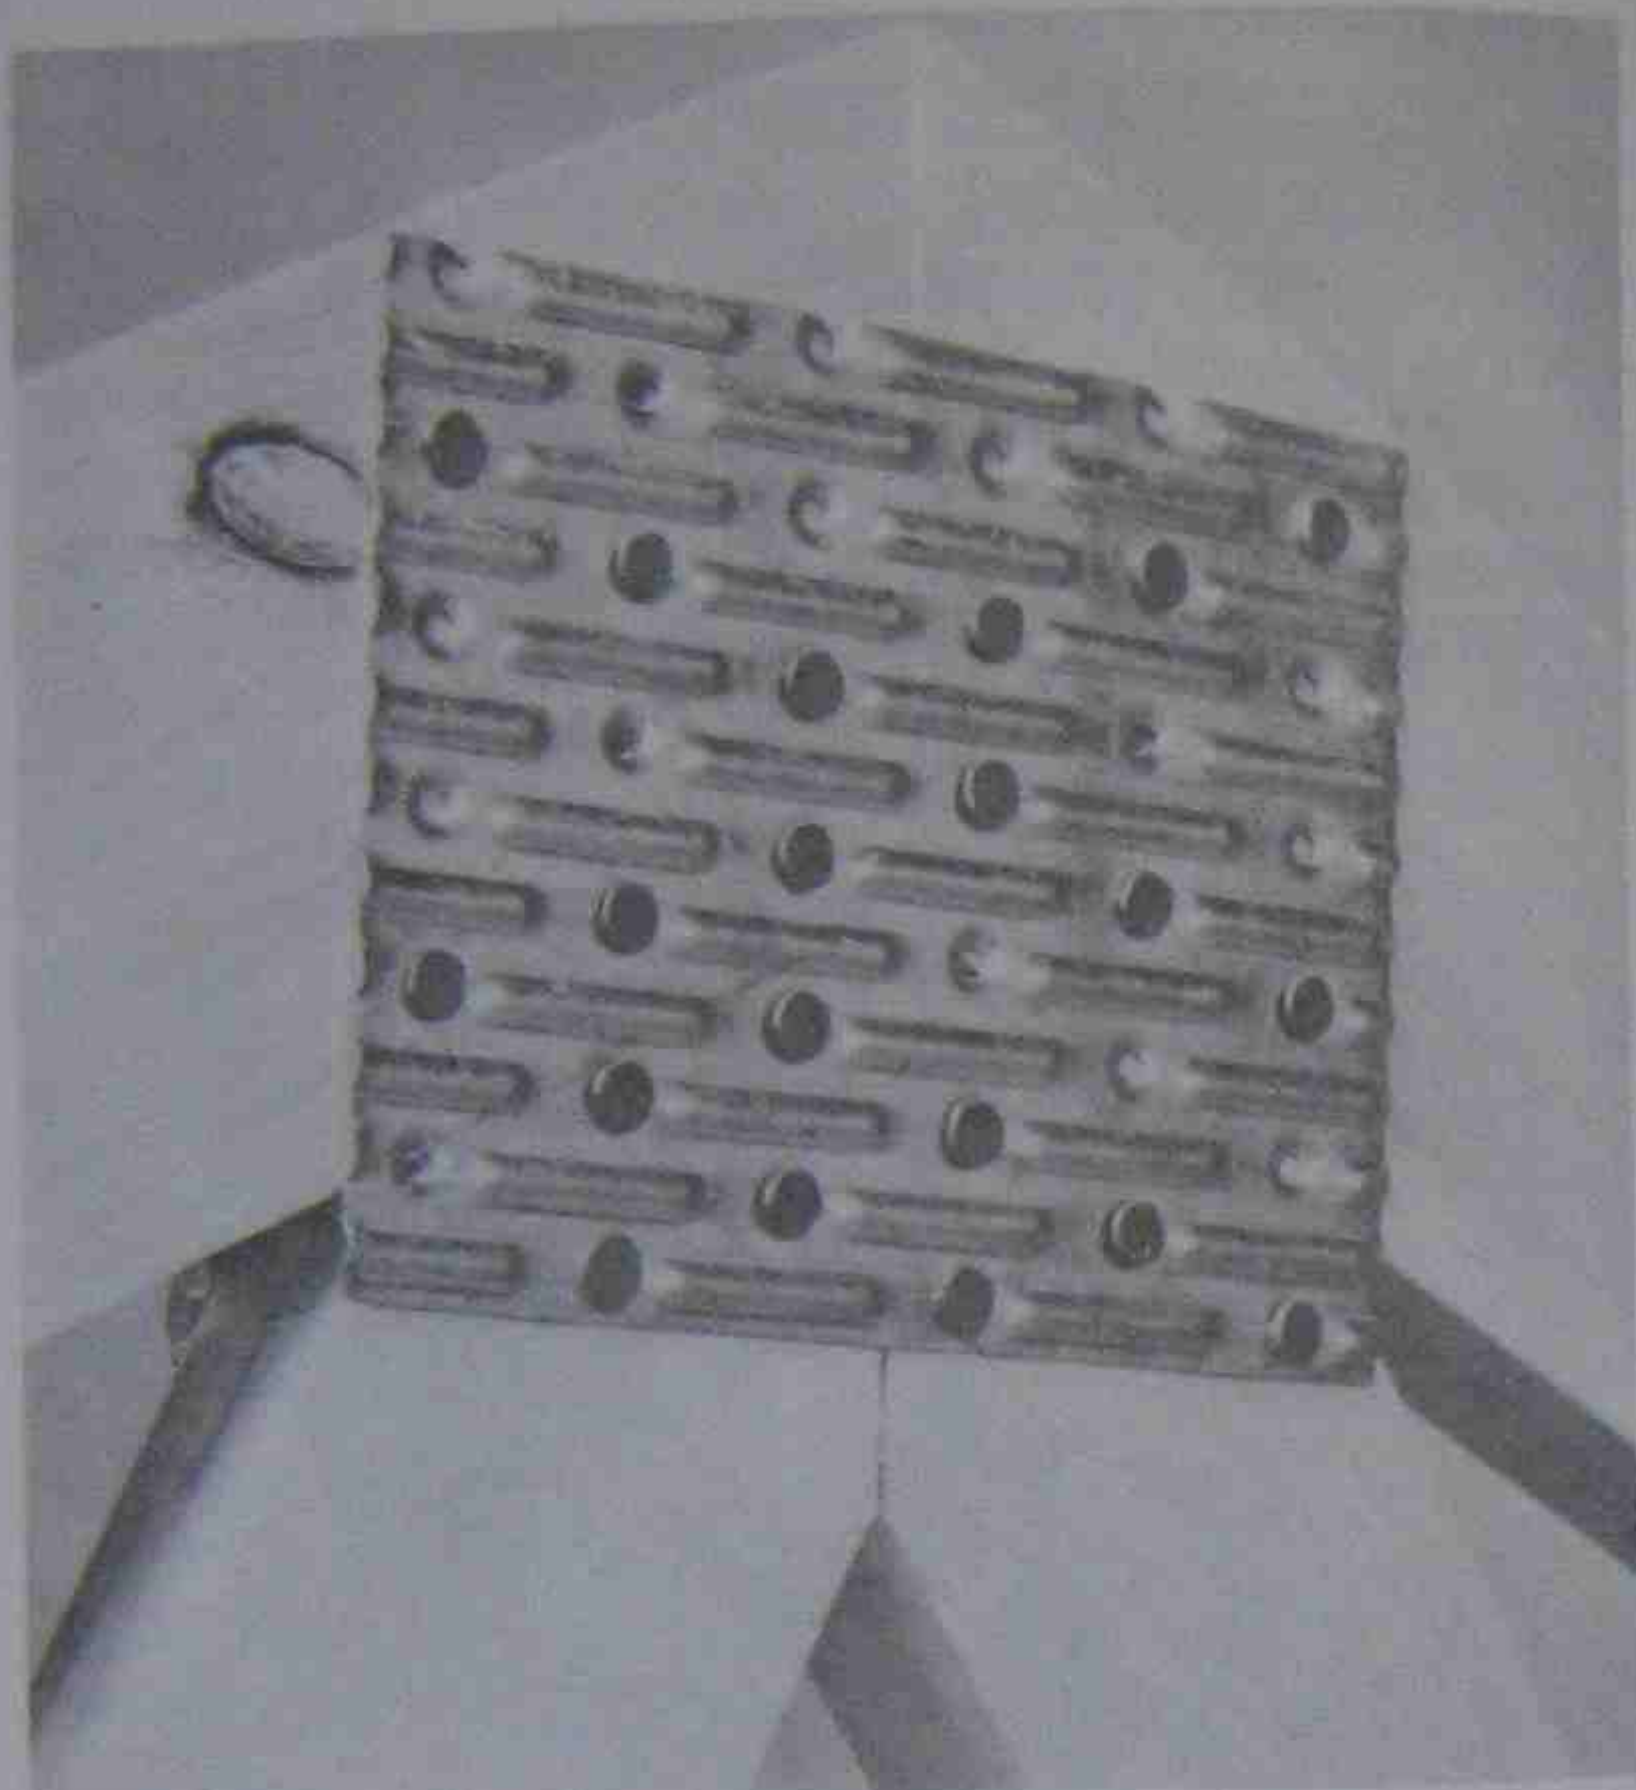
Nail plate (Bat-U-Nail truss plate)
